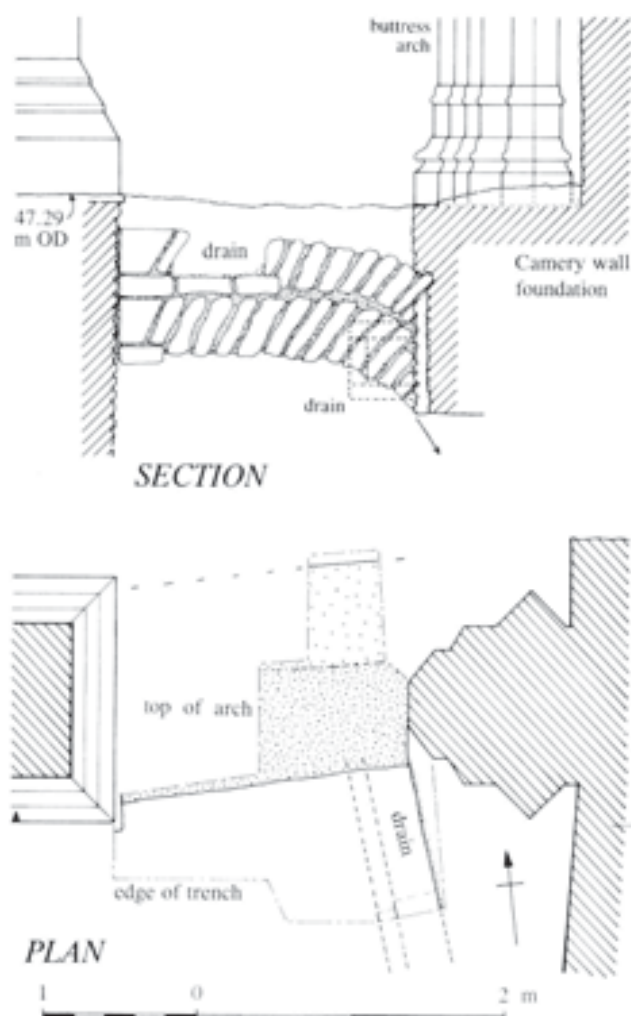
Sketch plan and elevation of the ground-arch discovered in 1954 beneath the buttress-arch at the south-east angle of the Lady Chapel. After W.A. Wheeler and A.D.R. Caroe. Scale 1:50
